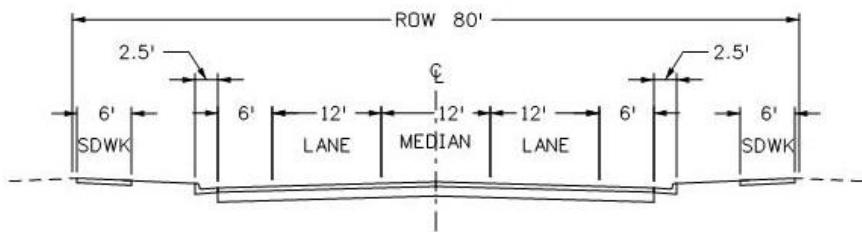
Proposed Eastonville Road Cross-Section South of Stapleton Drive
